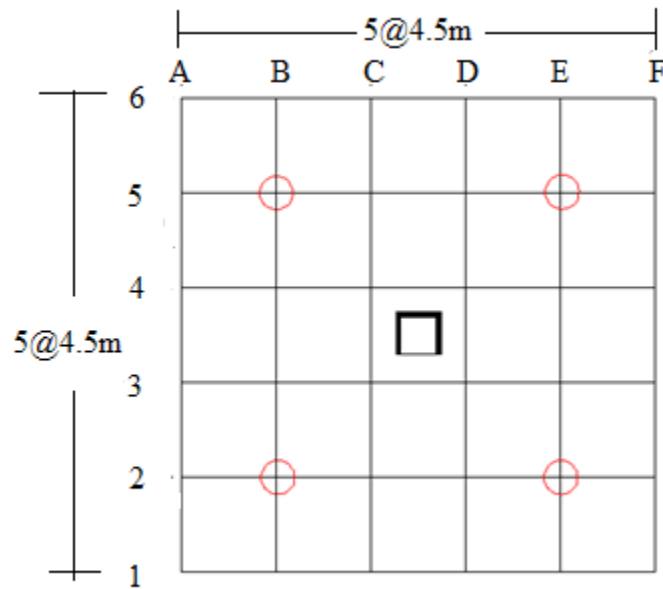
19 Floating column at parallel position, 4th floor and lift shear wall at center
